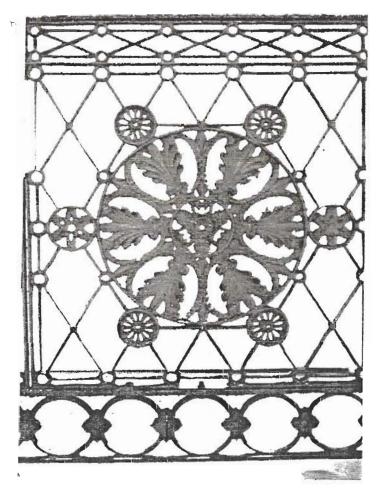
Cast Iron Filigree Railing Medallion Detail at Roof Vent Structure; West Face.
